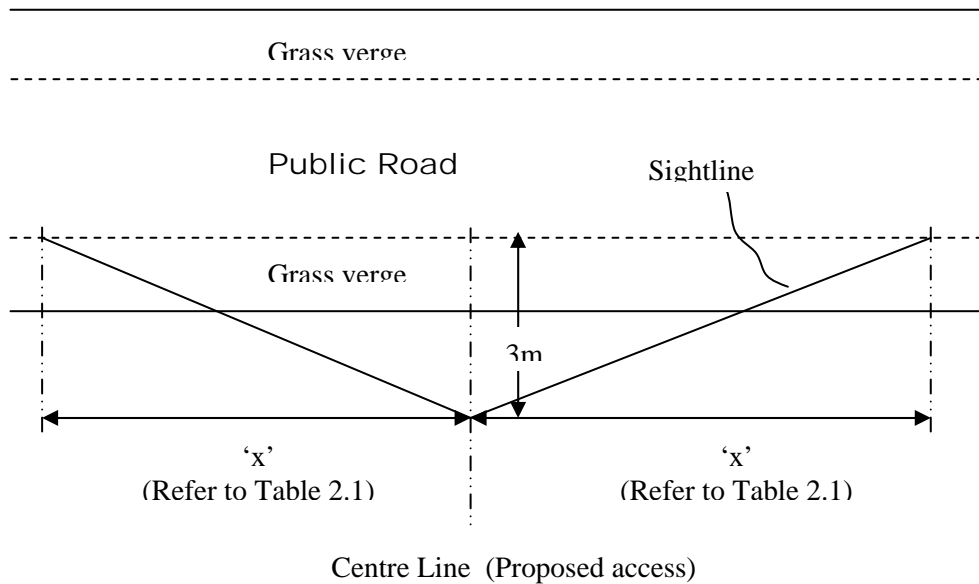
Desired minimum sight triangles – dimension 'x' joining public road
